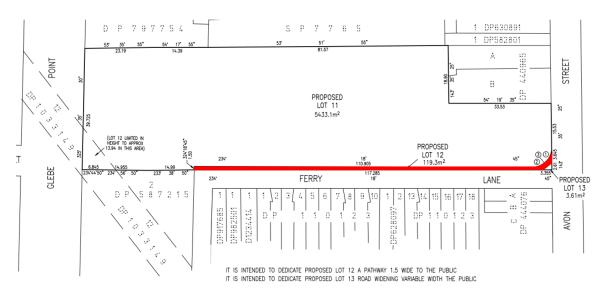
Site plan depicting land dedication for footpath widening on Ferry Lane
